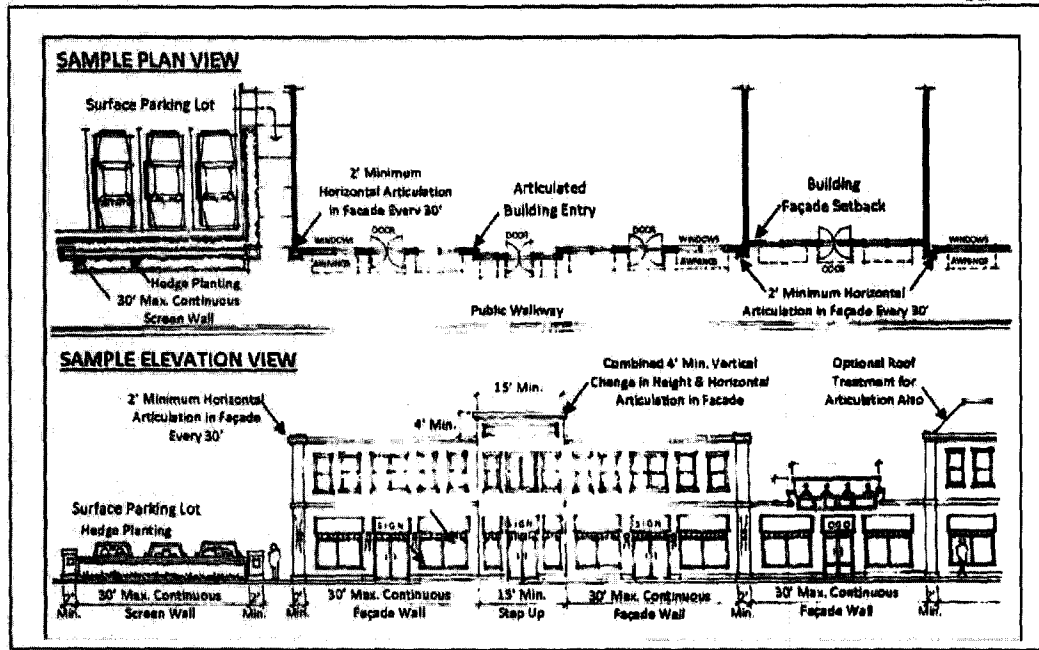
VERTICAL AND HORIZONTAL ARTICULATION OF BUILDING FACADES
